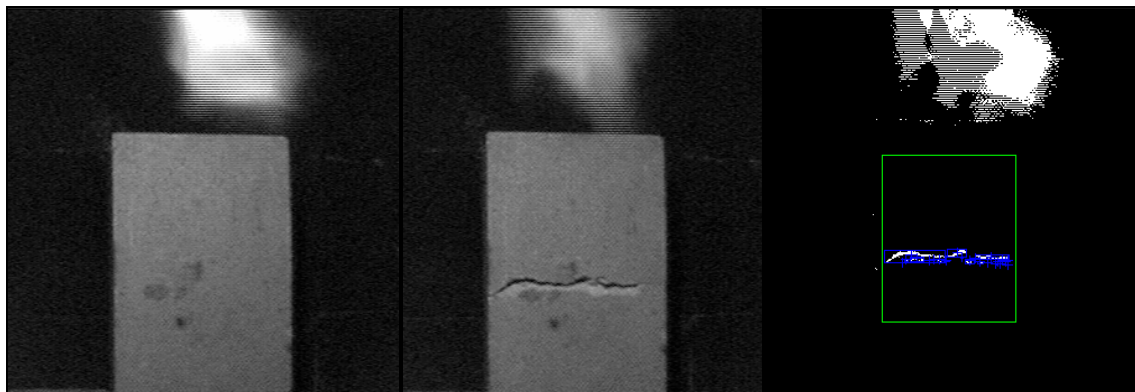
Undamaged brick, cracked brick, and ROI compare model.
